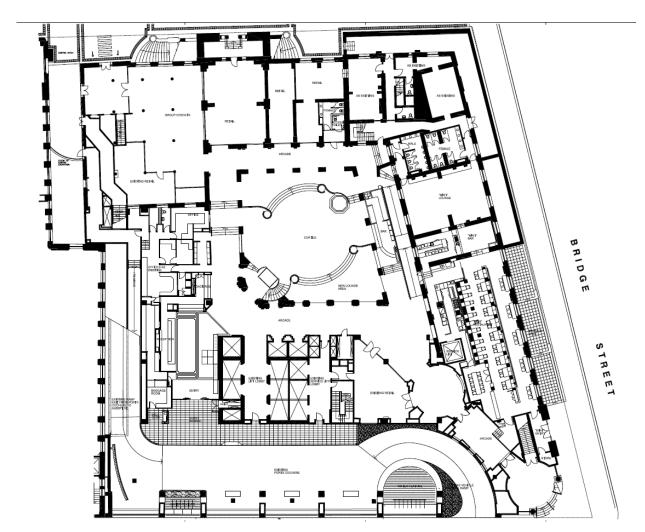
Extract of accommodation survey from 2004: Basement Plan
